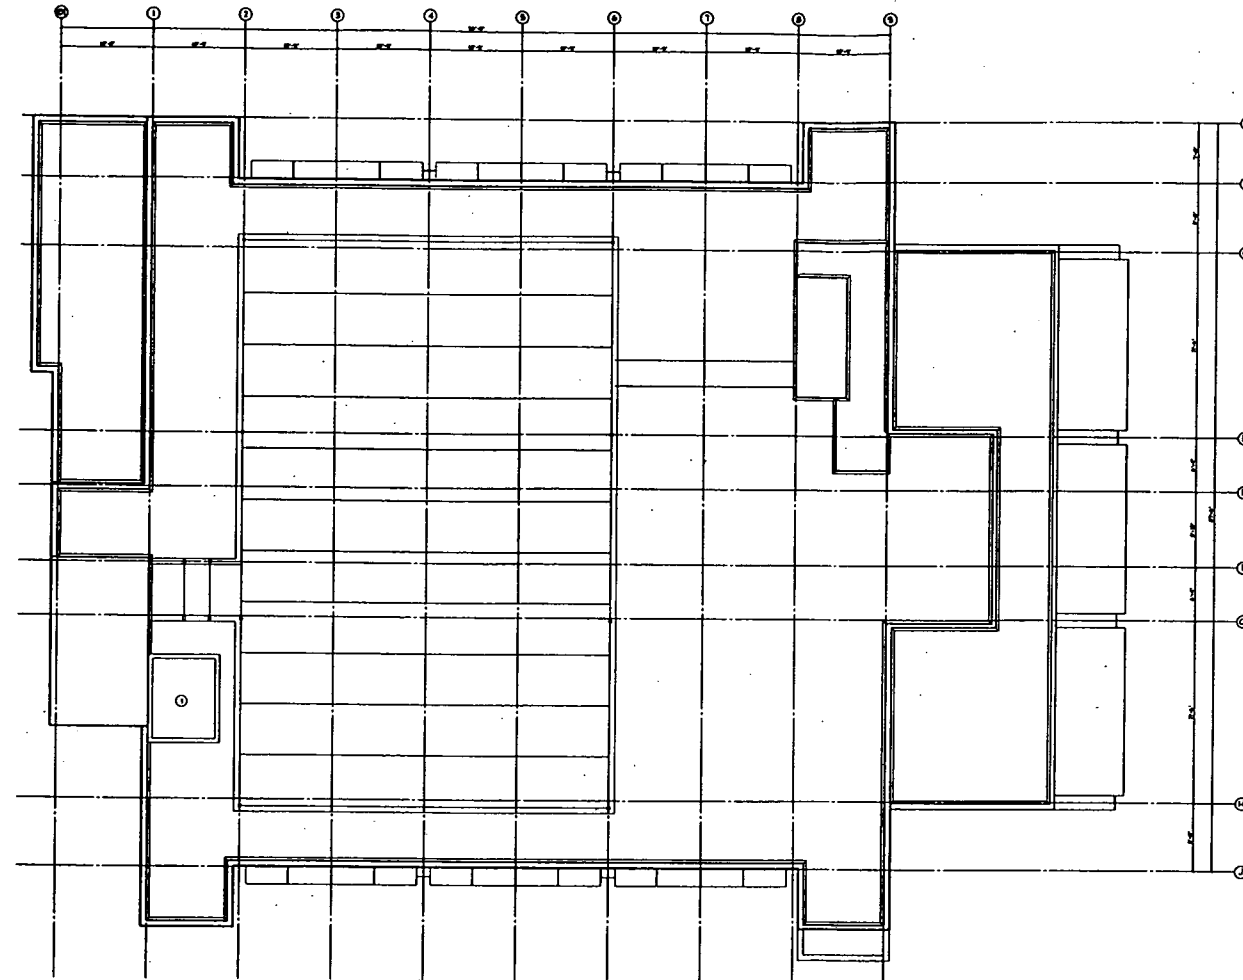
EXHIBIT C - FLOOR PLANS AND SPECIFICATIONS
